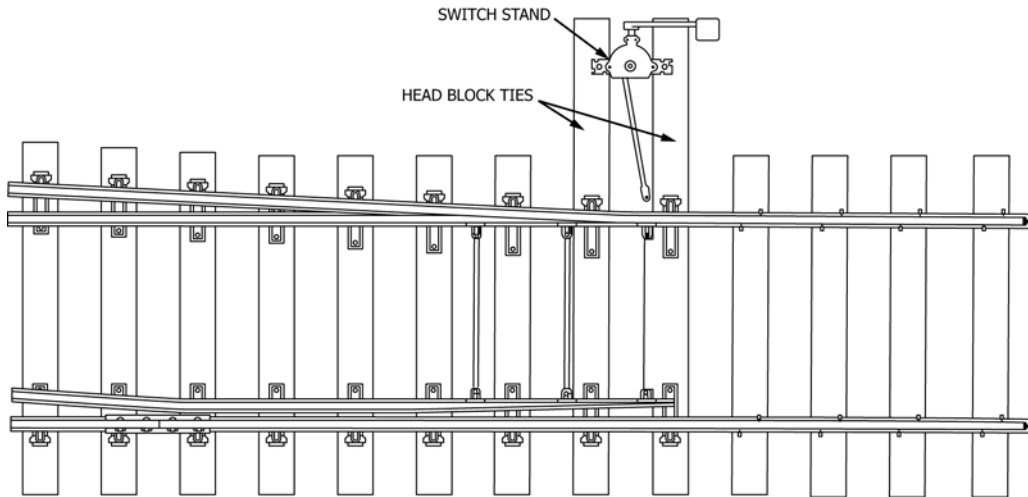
Head Block Ties Supporting a Switch Stand at a Turnout
